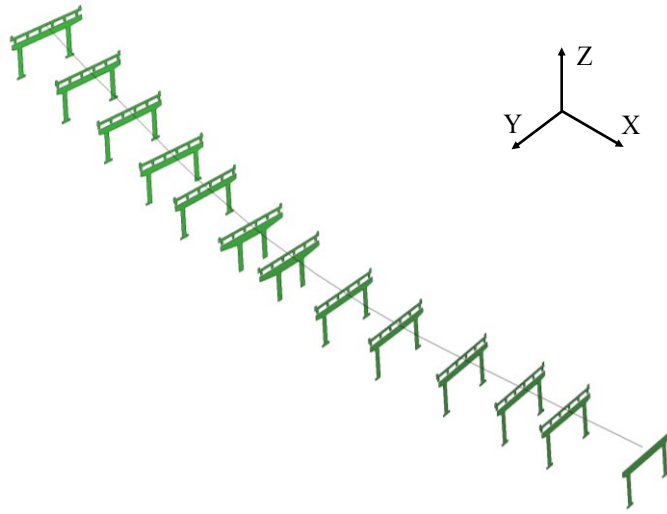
Construction of NURBS surfaces for each pier and deck structure.
